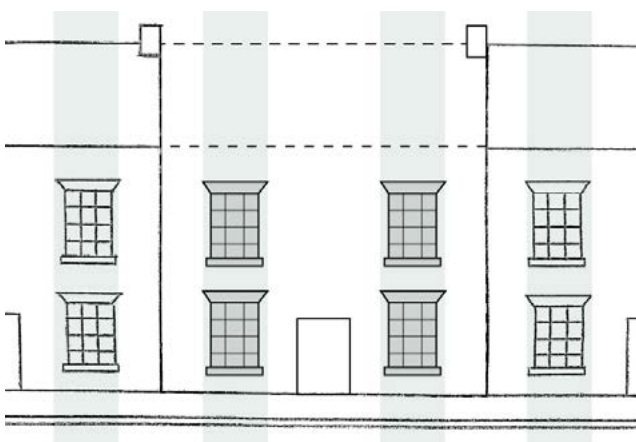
Elevation showing typical building proportion in a detached house. The proportion of a building's elements should be related to each other as well as the scale and proportion of the overall building.
